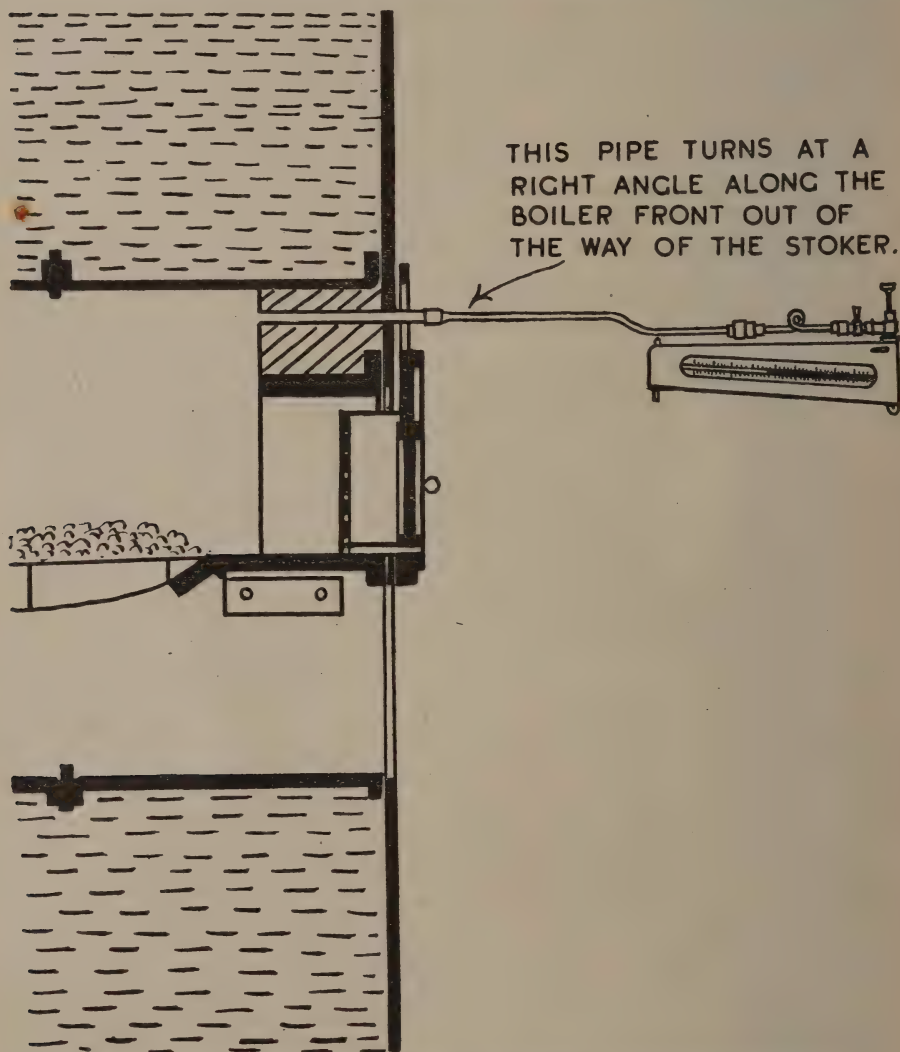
Gauge in position on boiler front for taking draught over the fire.
